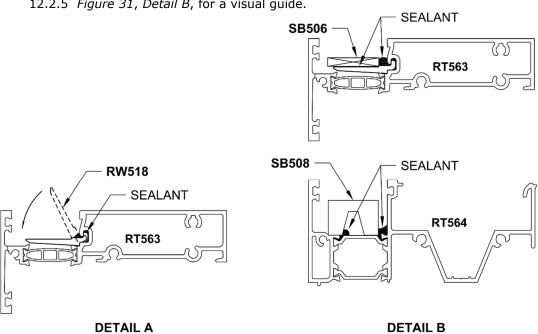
Setting Chair and Setting Block Installation, Flat Surface Assembly
